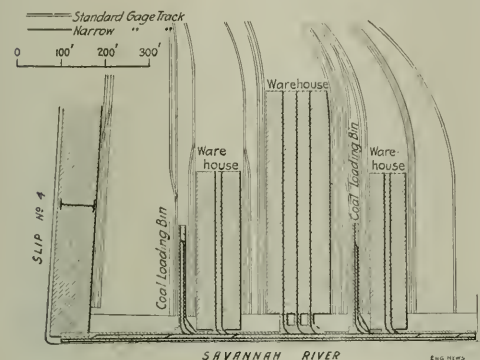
DETAIL OF FERTILIZER HANDLING PLANT AT SAVANNAH
